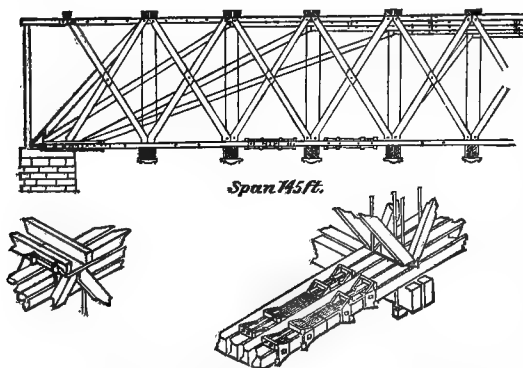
Wooden Railroad Bridges on Balt. and Ohio R. R.
